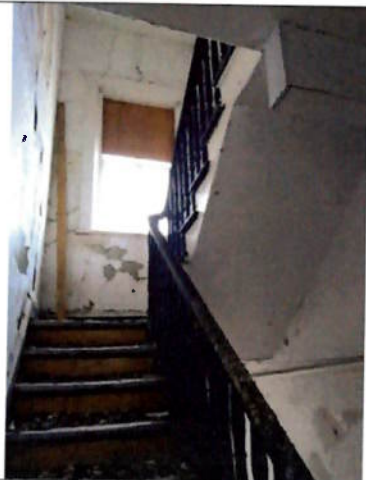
Surviving dogleg, open string staircase with continuous handrail.
